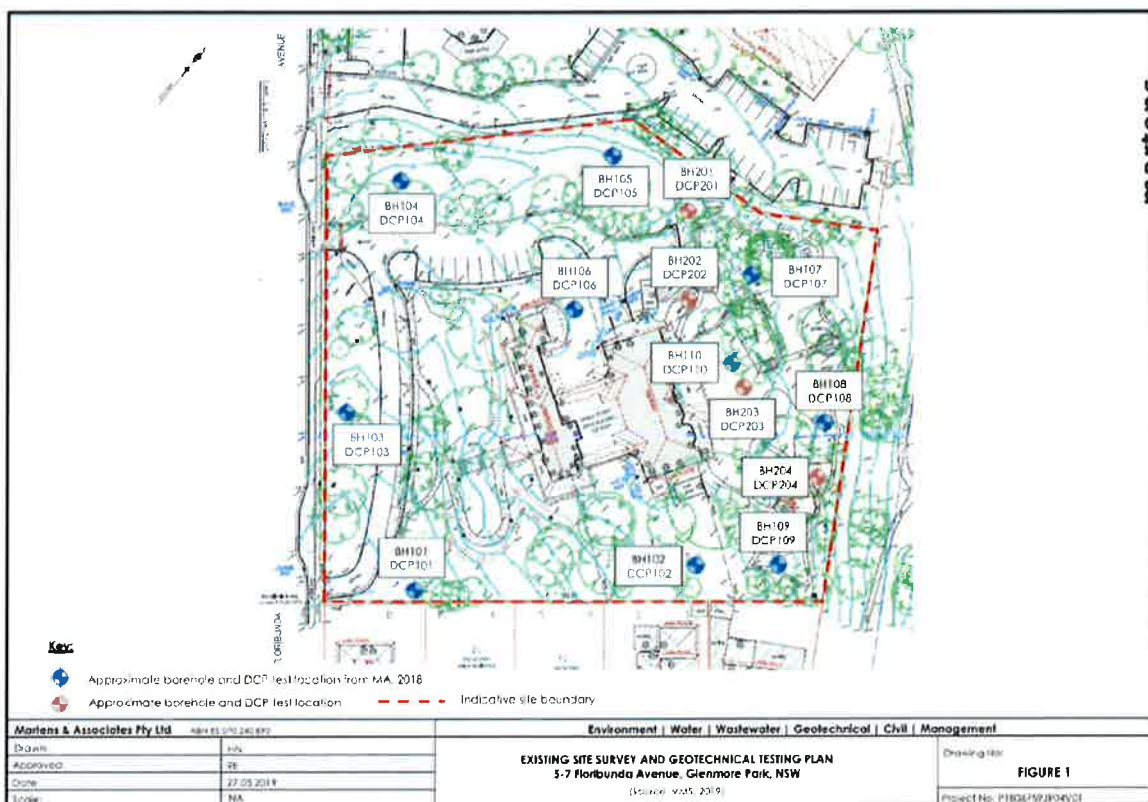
Existing Site Survey and Geotechnical Testing Plan (Source: Martens, 2019)
